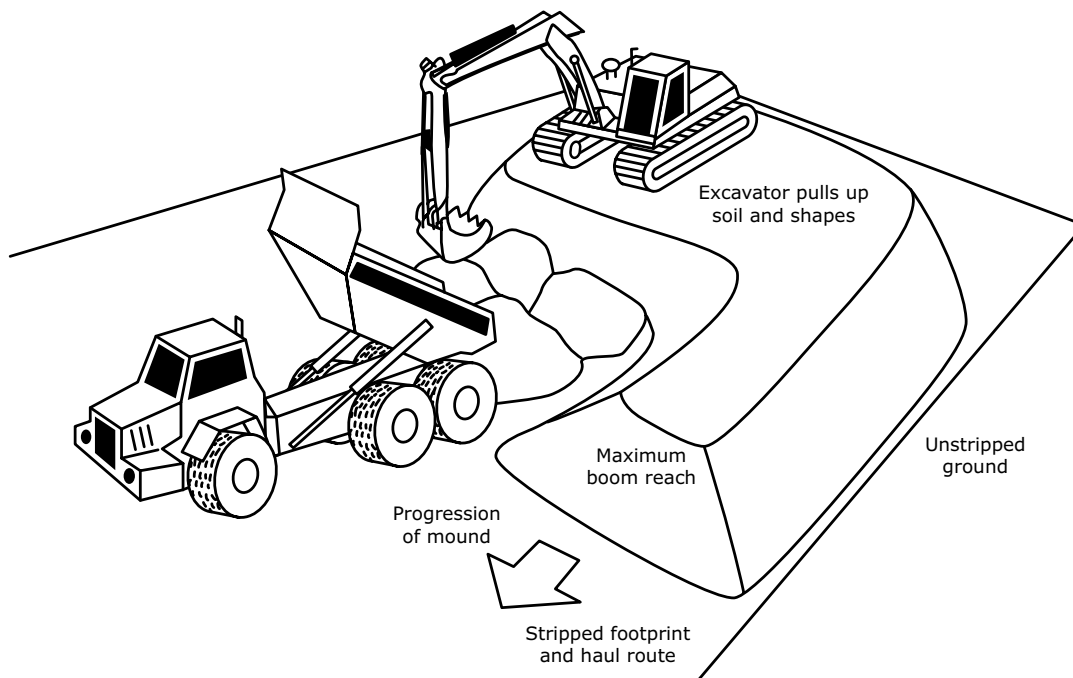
Soil storage mound construction with excavators and dump trucks: Single tier mound.
